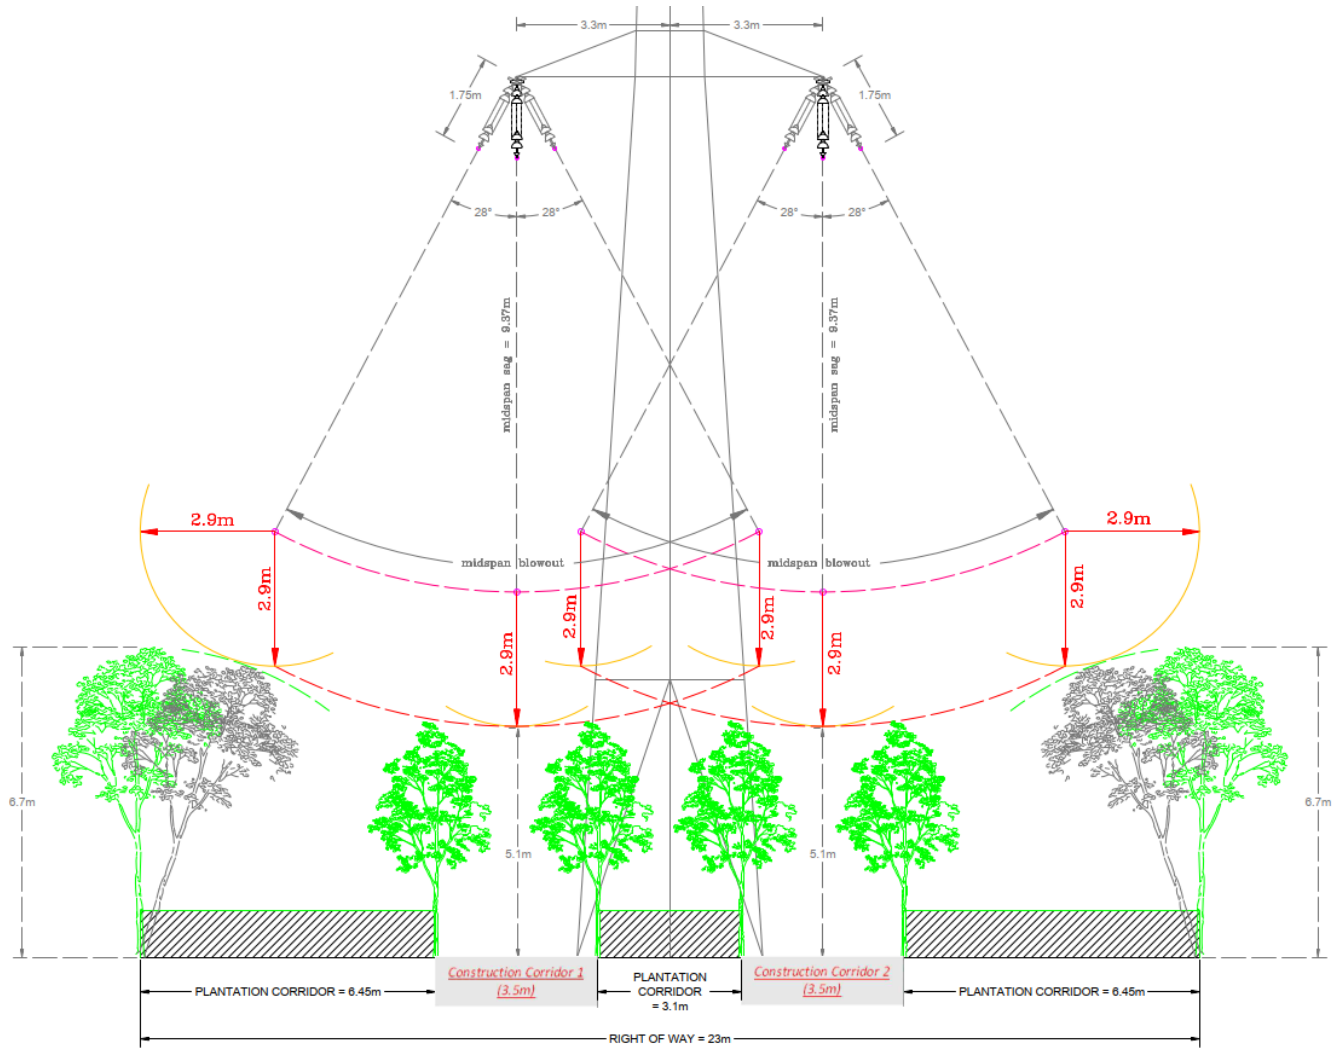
132kV TL Plantation Corridor @23m ROW
